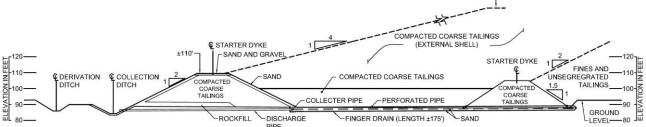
Typical Section of Tailings Impoundment No. 2 (Not to Scale)
